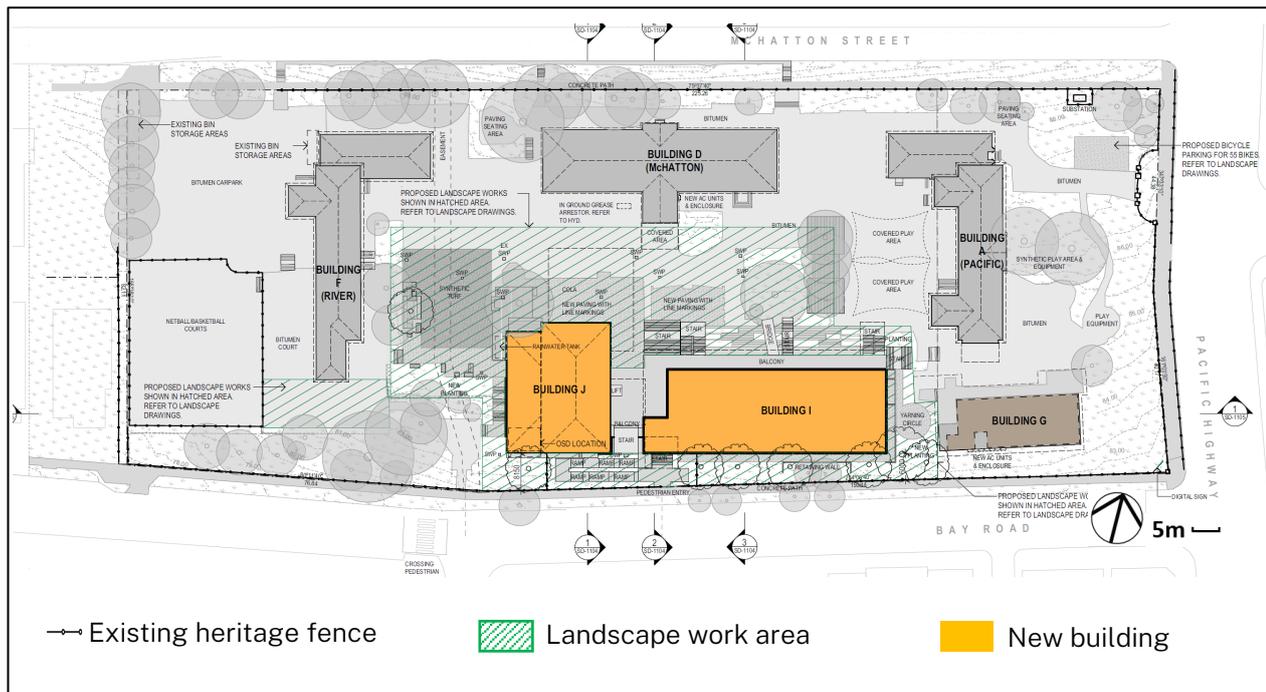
| Approved site plan (Source: Approved plans, 2022)
